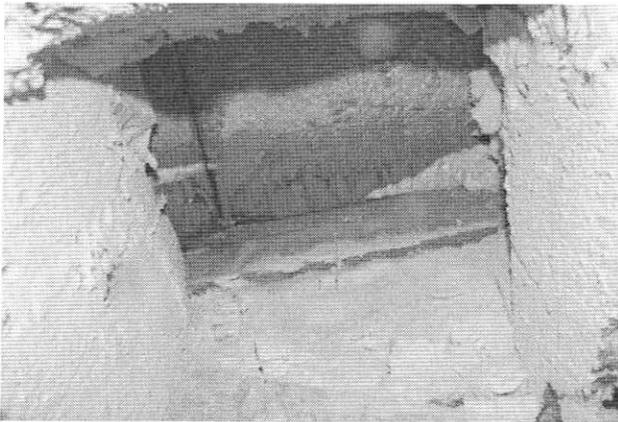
, roof truss above garage area with foam removed to show truss top cord, no
